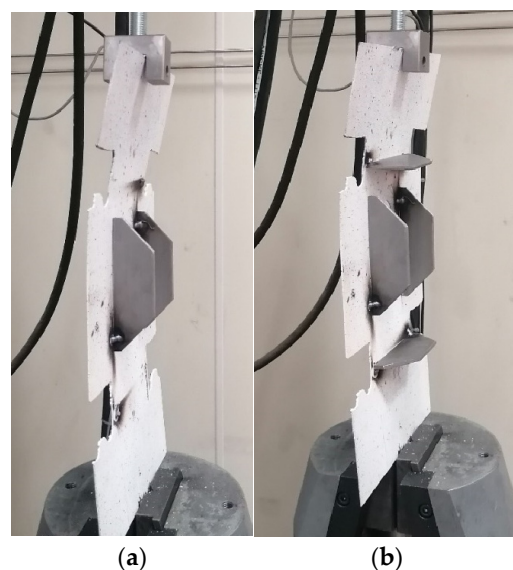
Deformation pattern under longitudinal compression: (a) stiffening method c and (b) stiffening method b.
